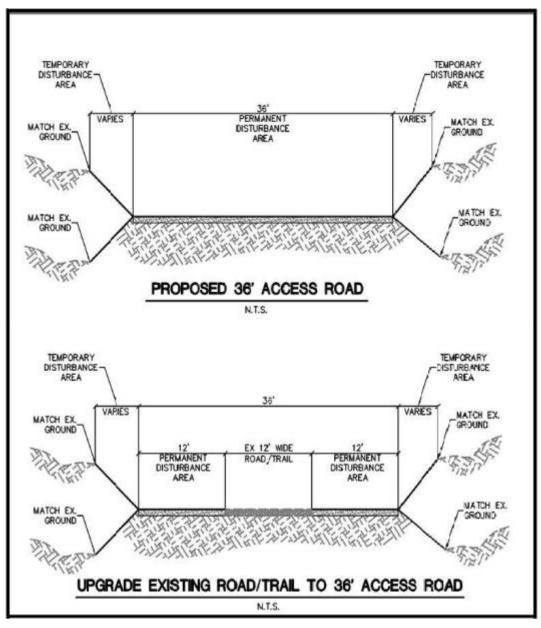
Typical Cross-Section for Project's 36-Foot-Wide Access Roads and WTG Entry Roads
